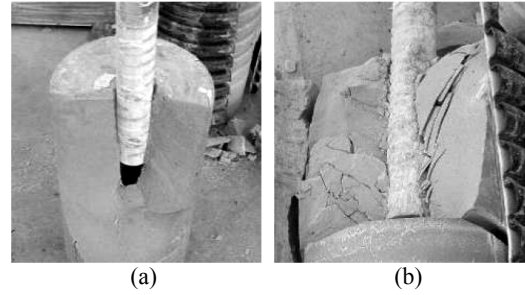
Fracture patterns after pull out tests: (a) standard AM and (b) corrugated CRG pipe samples
